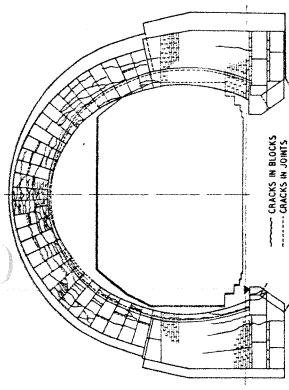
Destructive deformation of a lining in Karawanken tunnel by stress-rearrangement pressures caused by the absence of an invert
